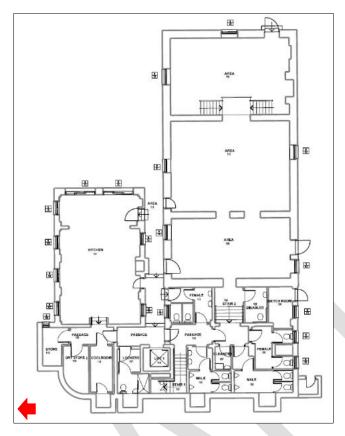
Basement Level Plan (Source: Planning & Infrastructure Sydney Harbour Foreshore Authority, 2012)
